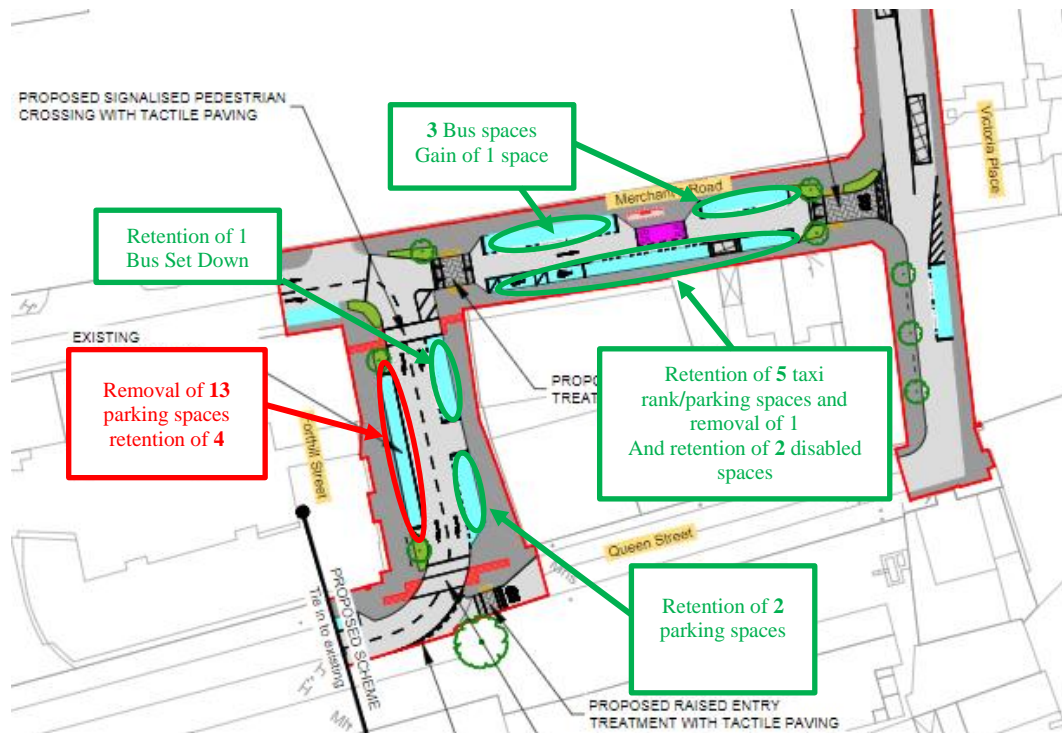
Proposed scheme design on Merchants Road, Forthill Street and Dock Road
